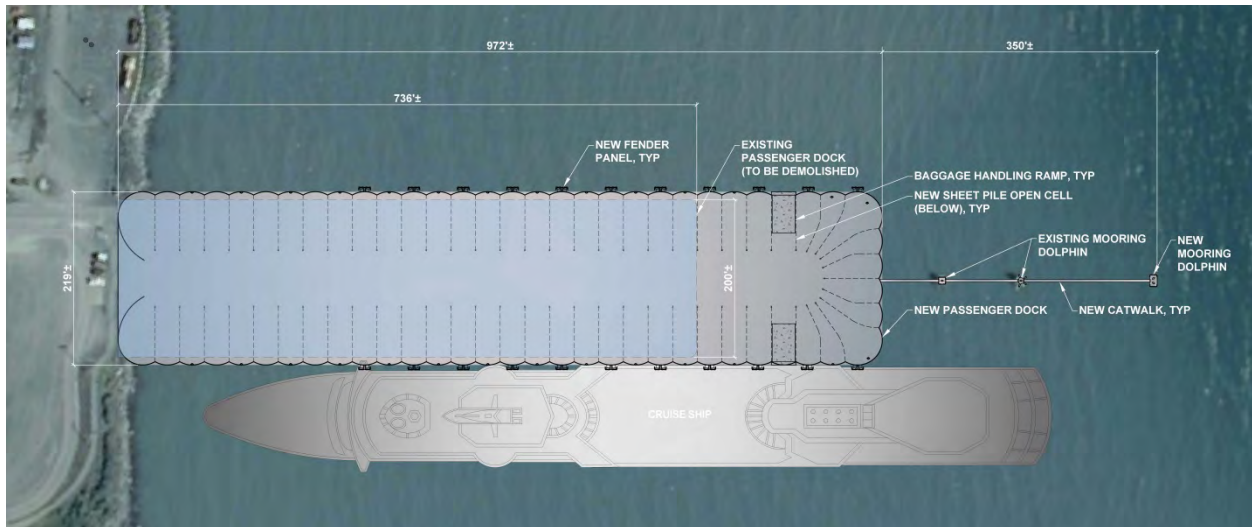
Option 1 – Full Size Open Cell Sheet Pile Bulkhead Dock
